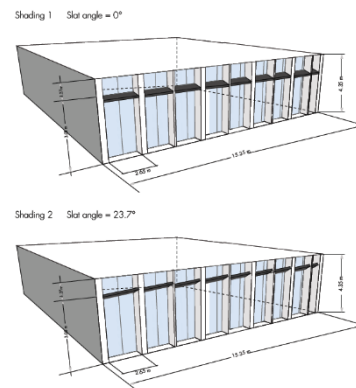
Facade elevation with the slat angle 0° and 23.7° shading design proposal of Zone 3 (South direction).
